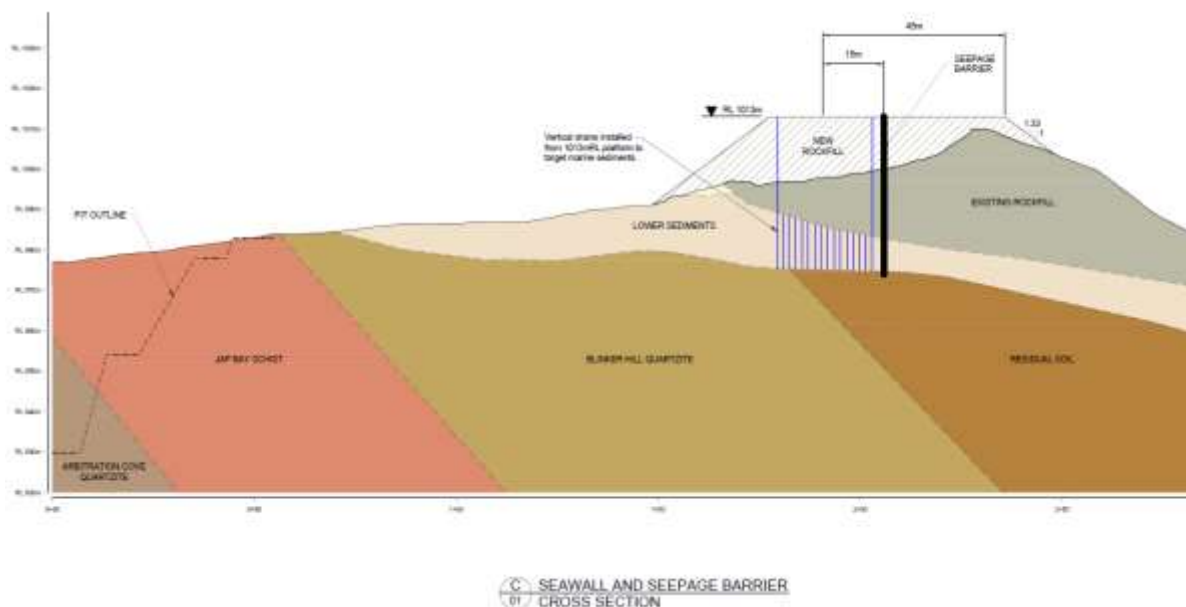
Schematic cross-section of the proposed reconstructed seawall through the breach area.
